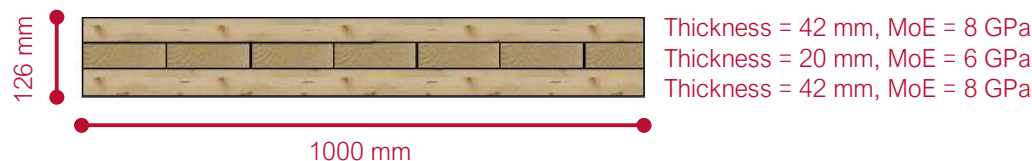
Red Stag CLT Panel Symmetrical Cross-Section
